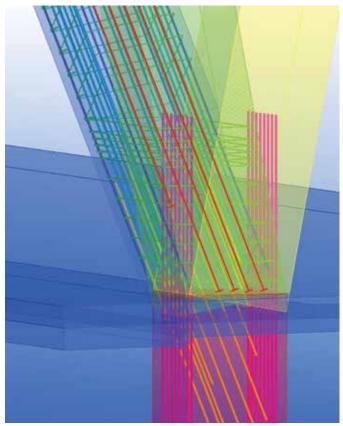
A Tekla 3-D model was used for reinforcement coordination at the base of the tree columns
